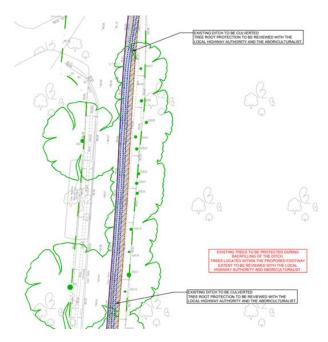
CON-XX-00-SK-C-0003 Rev P02 - Sheet 2 approaching the M25 bridge
